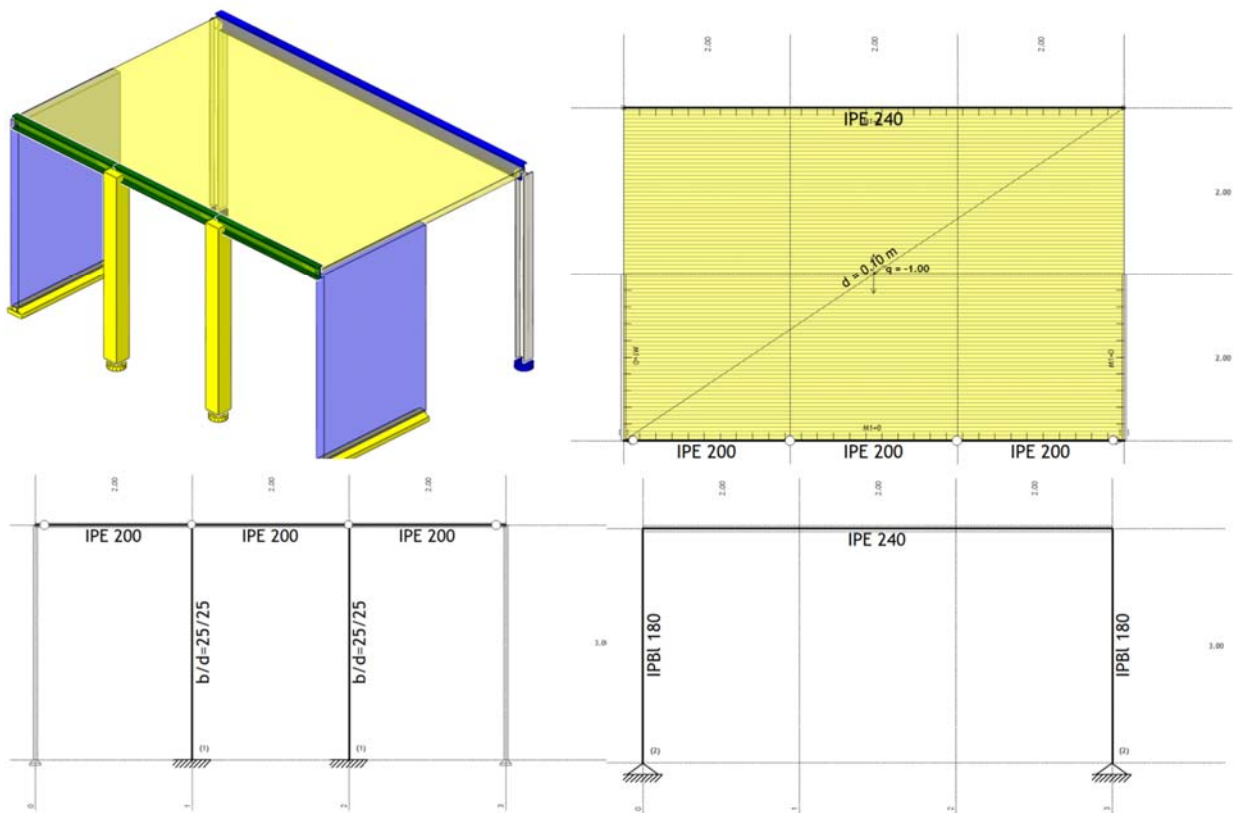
Numerical structural model for 3R Pilot house
